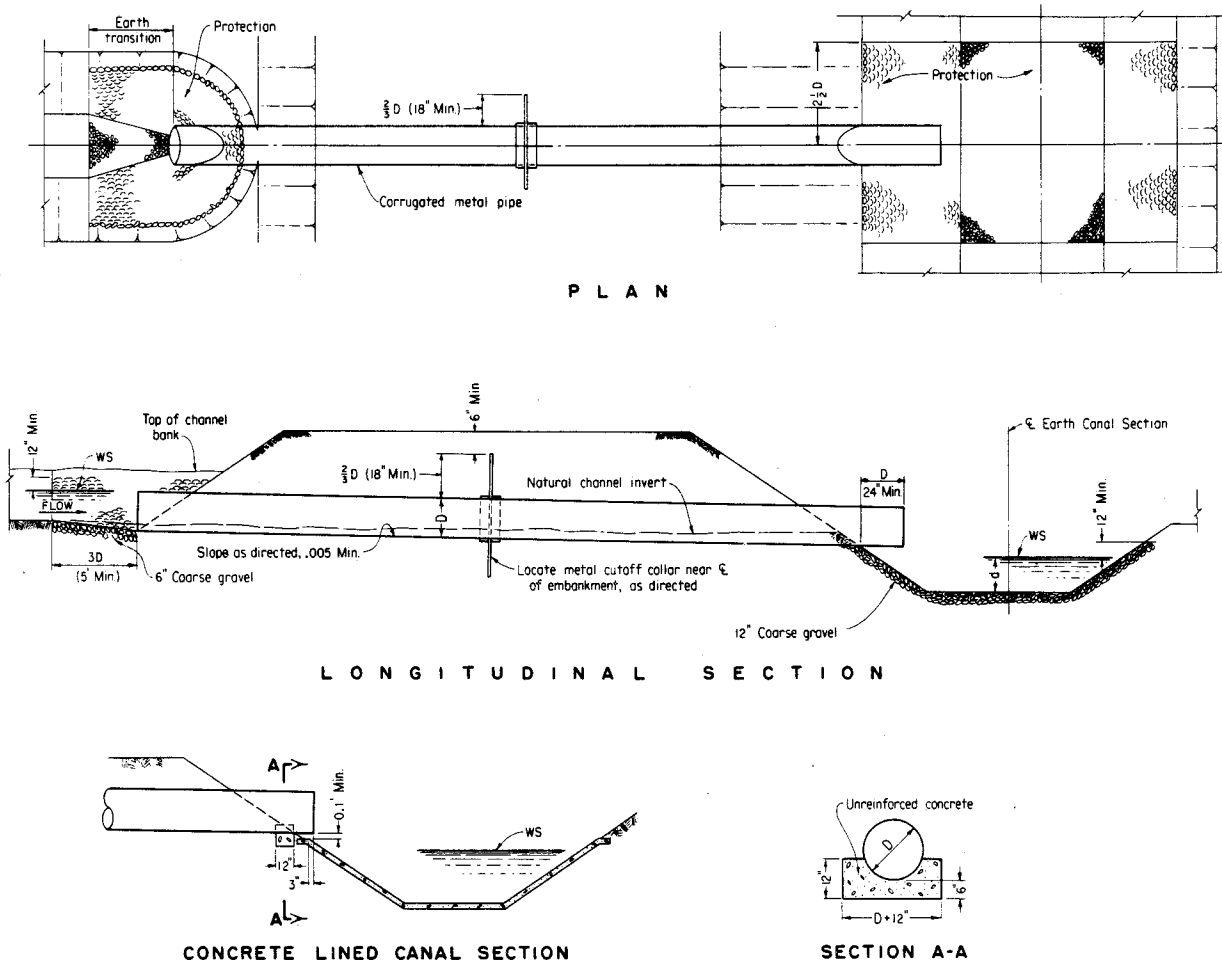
Drain inlet—plan and sections. 103-D-1312
